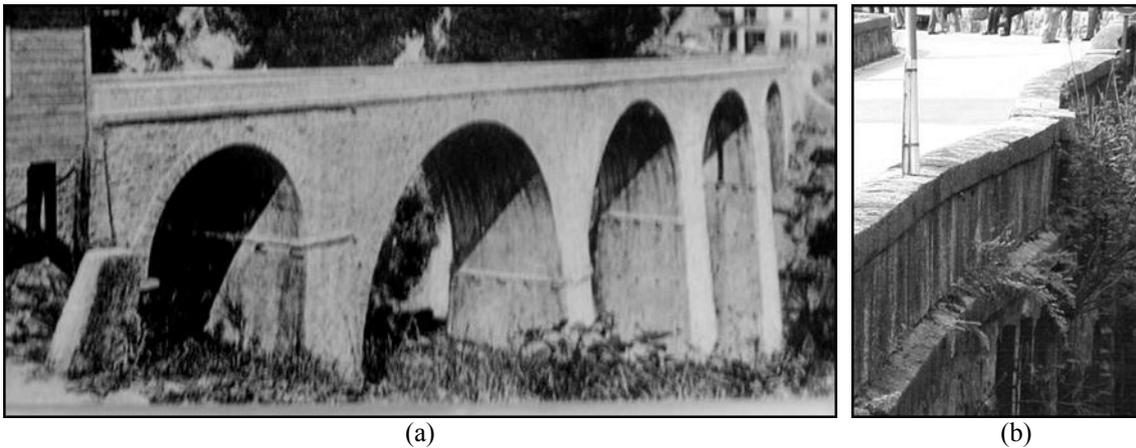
(a) Photograph taken during the construction of the bridge of Ribellasca in 1906, (b) Particular of the damages observed at present (very large transversal deformation of the lateral walls).
